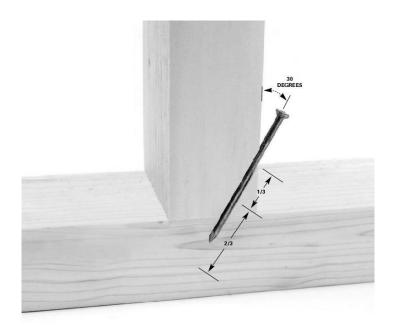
Example of a conventional building technique known as toenailing. Toenailing involves driving a nail at an angle through the end of a board to anchor it.
